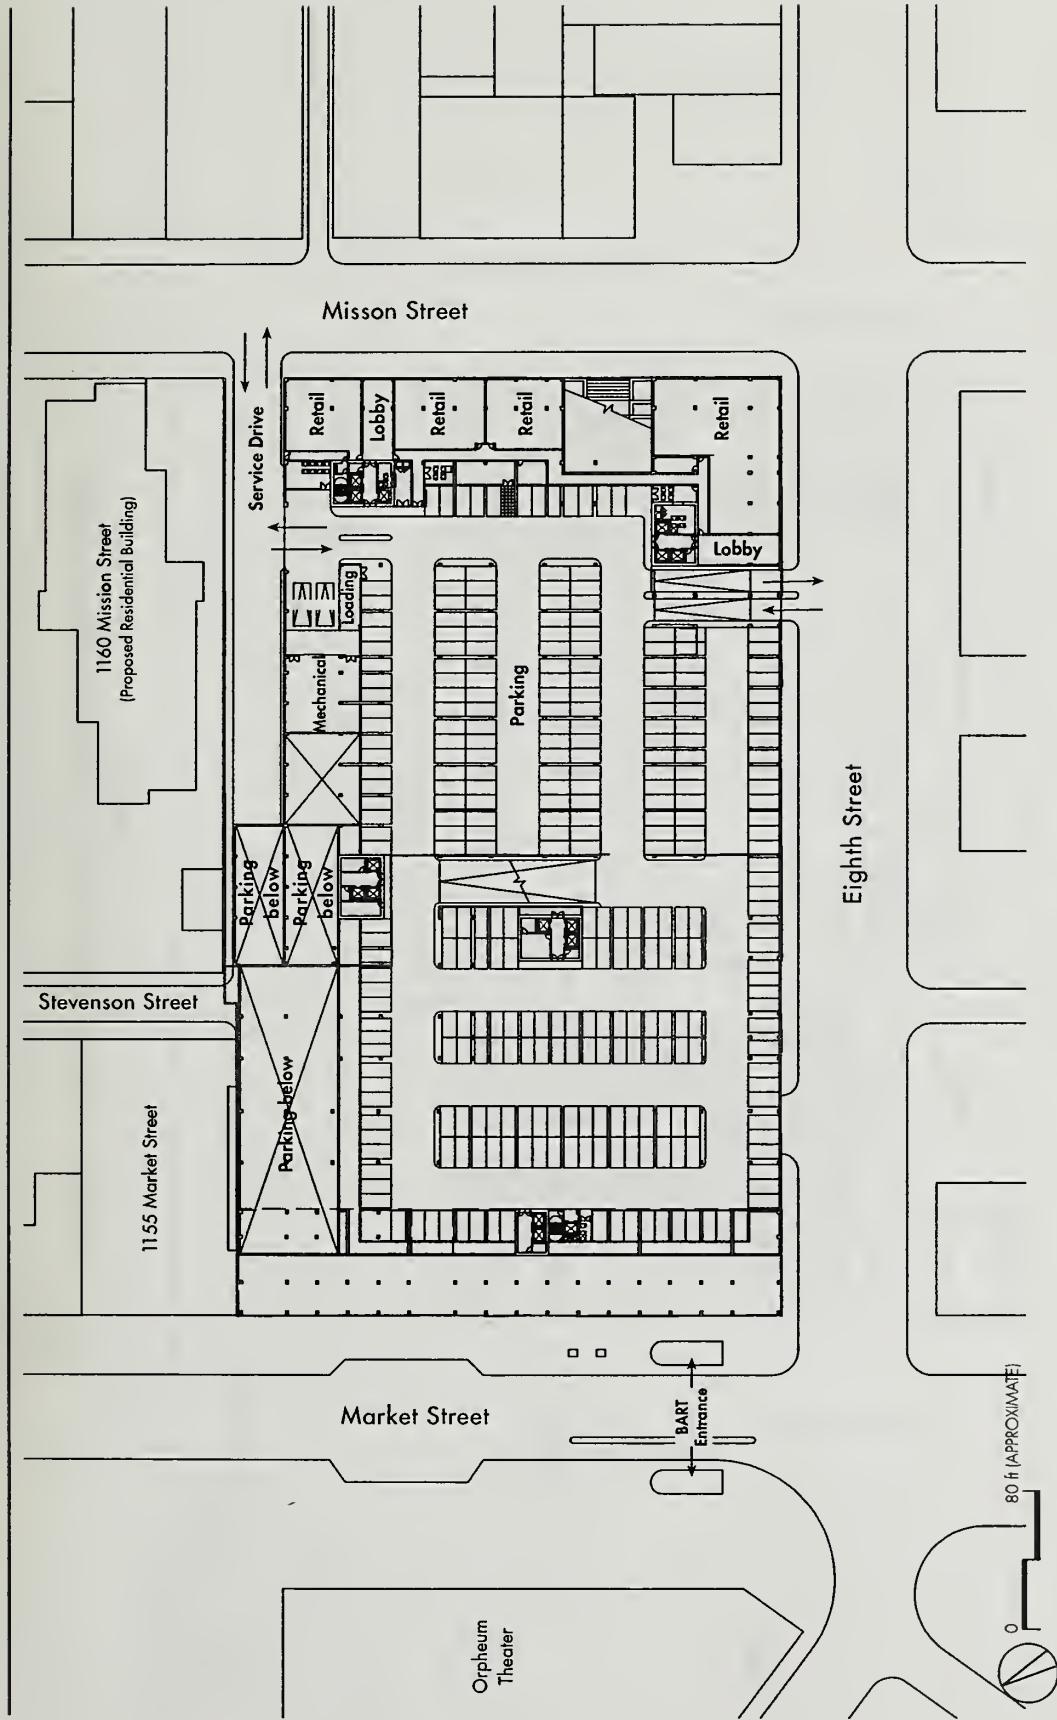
PARKING P-1 LEVEL FLOOR PLAN (AT MISSION STREET GRADE)
